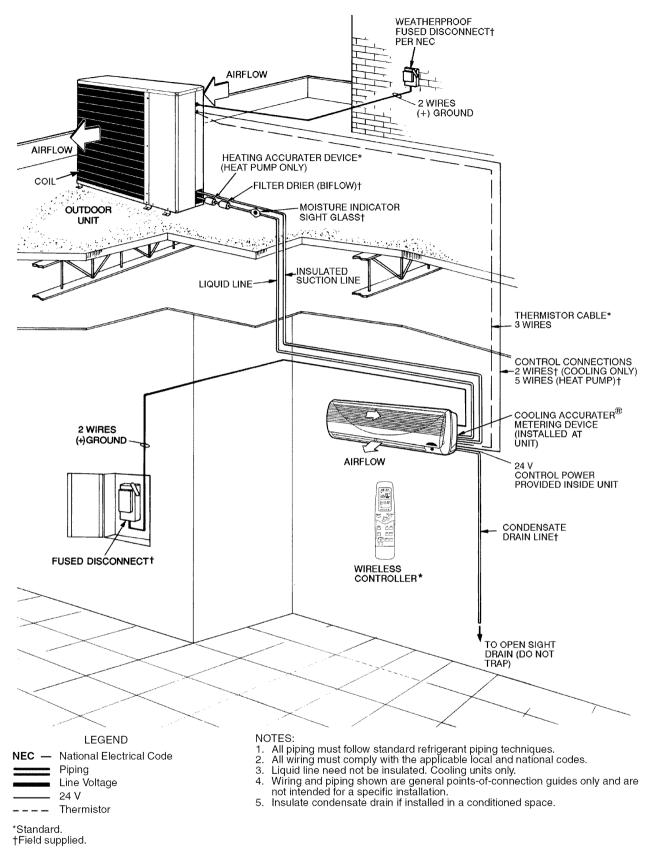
Typical Piping and Wiring — High Wall Systems, 18,000 and 24,000 Btuh
